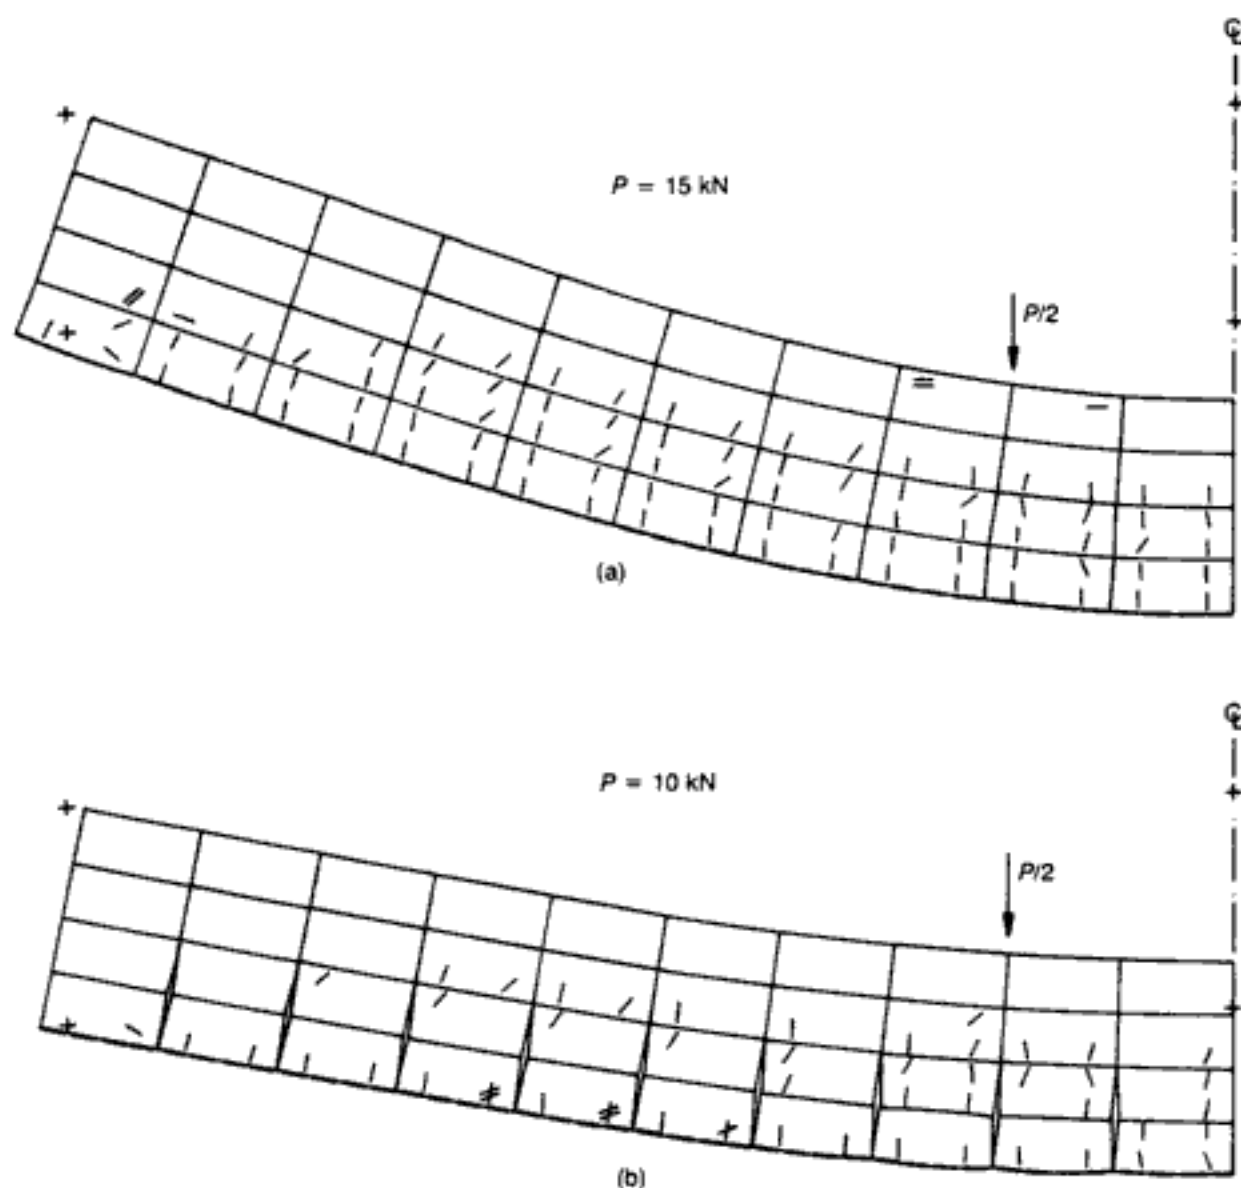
Effect of aggregate interlock. Crack patterns and deformed shapes at collapse of simply supported beams under two-point loading (only one-half of the beam is shown):⁵¹ (a) initially uncracked beam; (b) beam with preformed cracks
